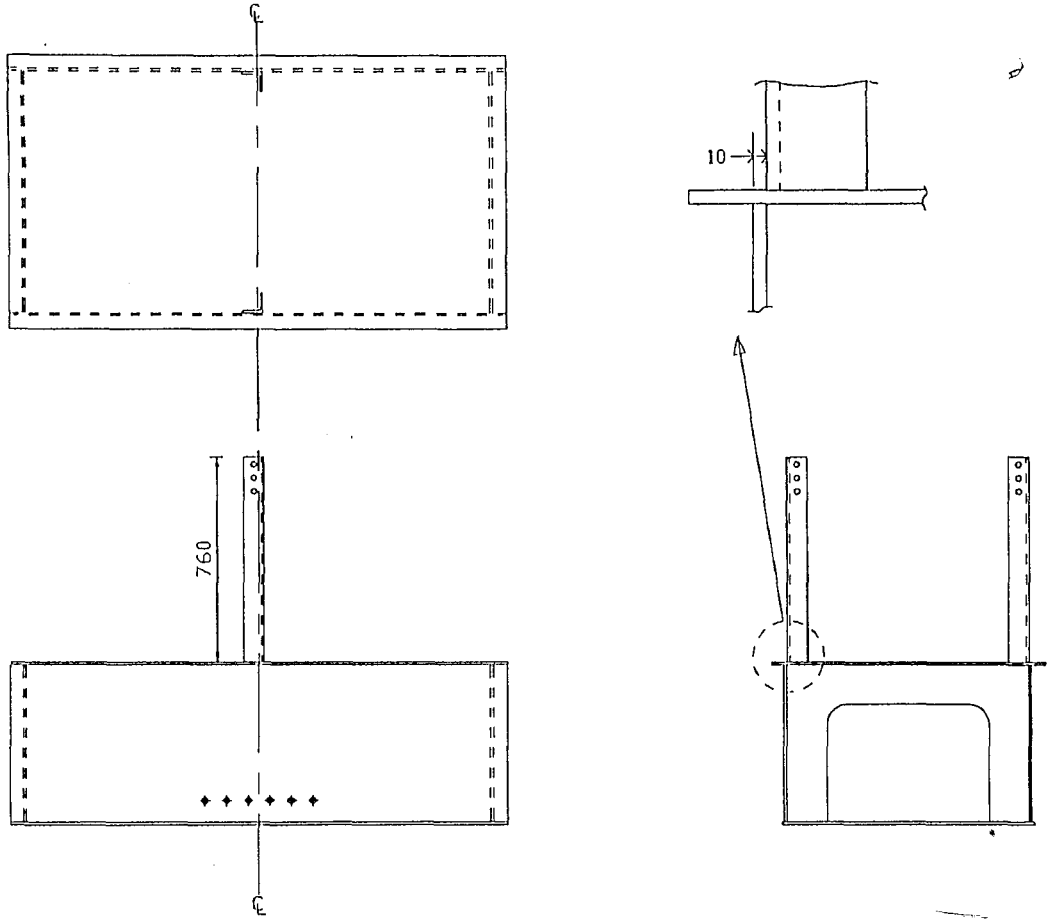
Alternate 2 - 1 plate thickness eccentric detail Axial Specimen detail drawing
